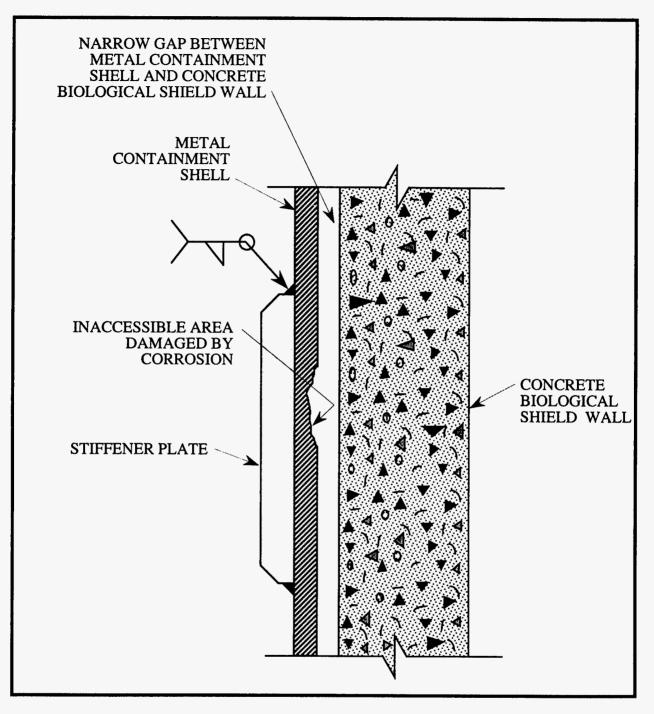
Stiffener plate repair welding technique.
